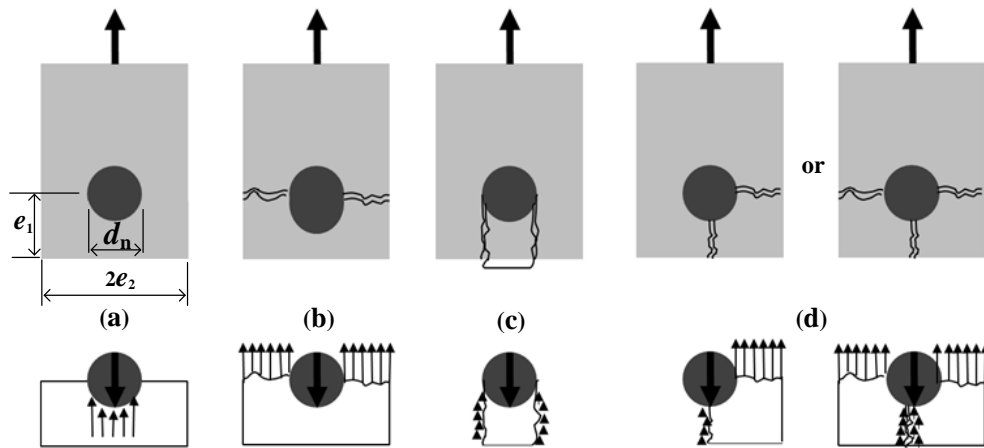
Plate-to-plate distinct modes of failure with a single steel bolt; (a) bearing; (b) net-tension; (c) shear-out; (d) cleavage.
